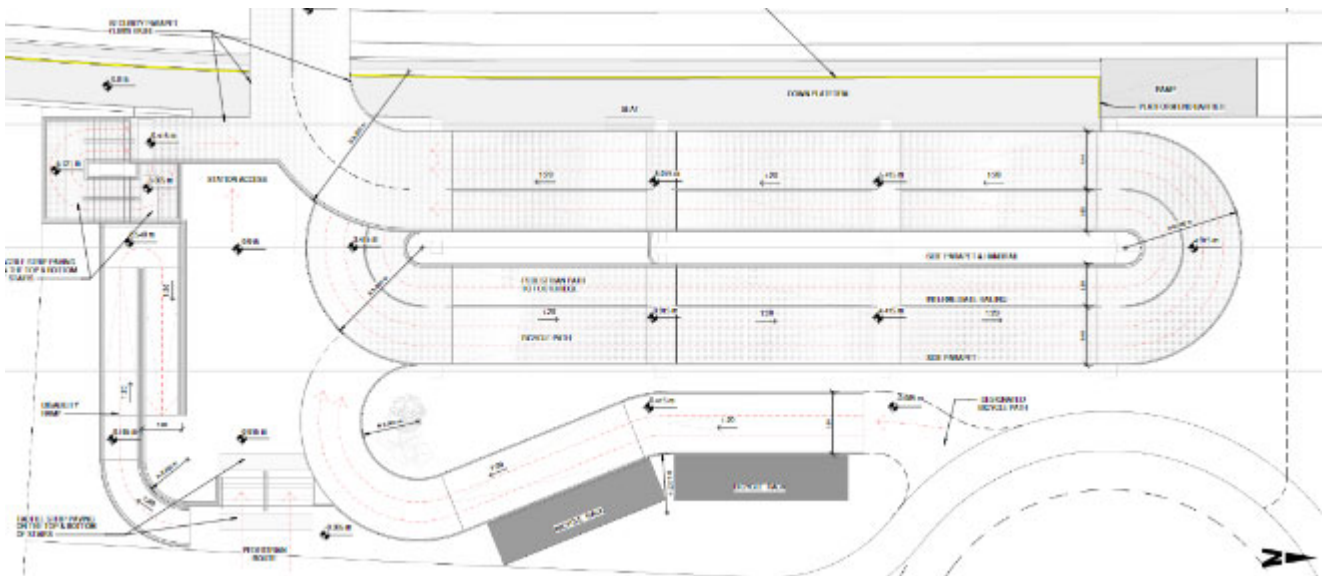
Proposed Station Plan - Eastern Platform & Station Access
